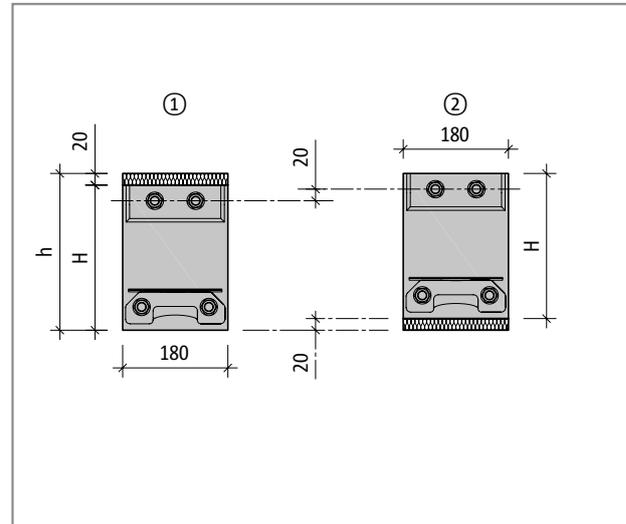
Schöck Isokorb® T type SK: Layout with offset heights
